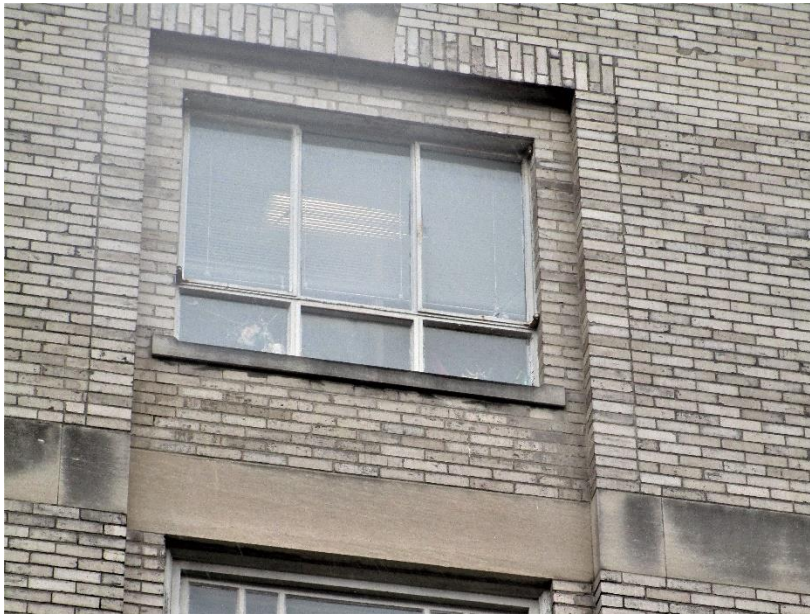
Steel casement window at third floor of 20 Trinity Street.
